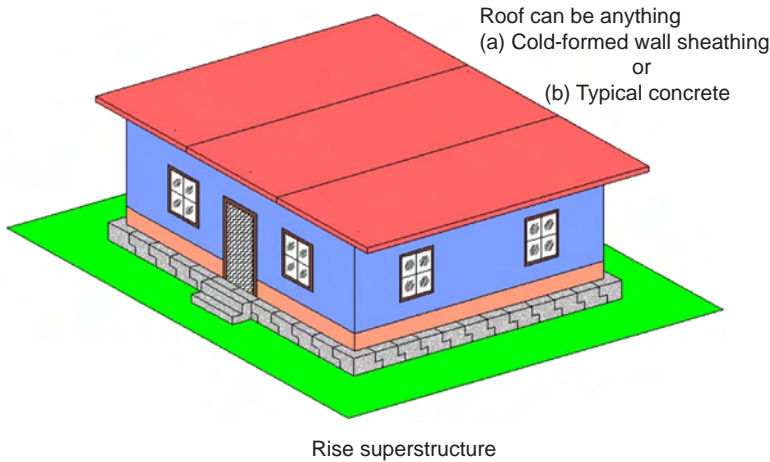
Erection of roof panels fabricated using LGSF (loading member)
